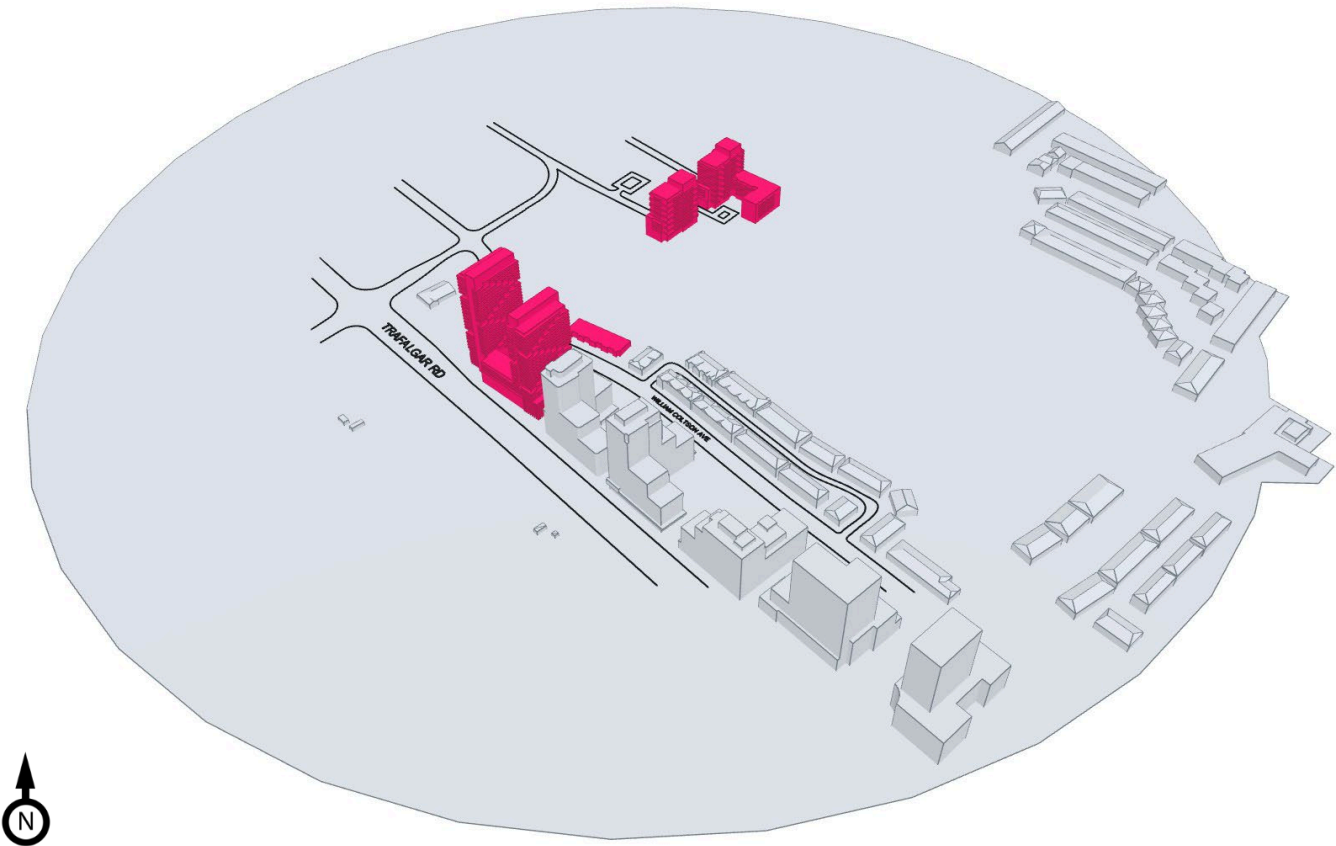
Computer Model of the Proposed Building and Existing Surroundings
